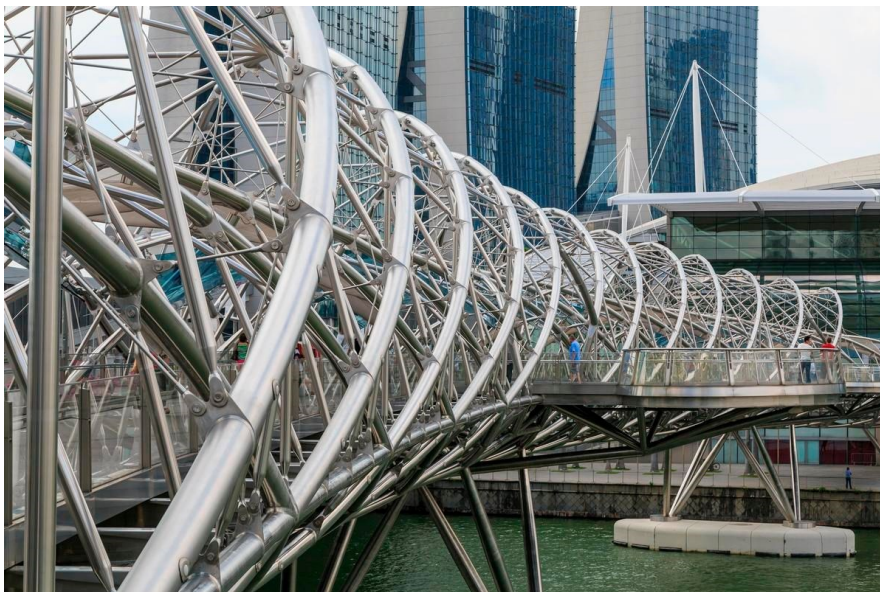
Stainless steel CHS truss in the Double Helix Bridge, Singapore
